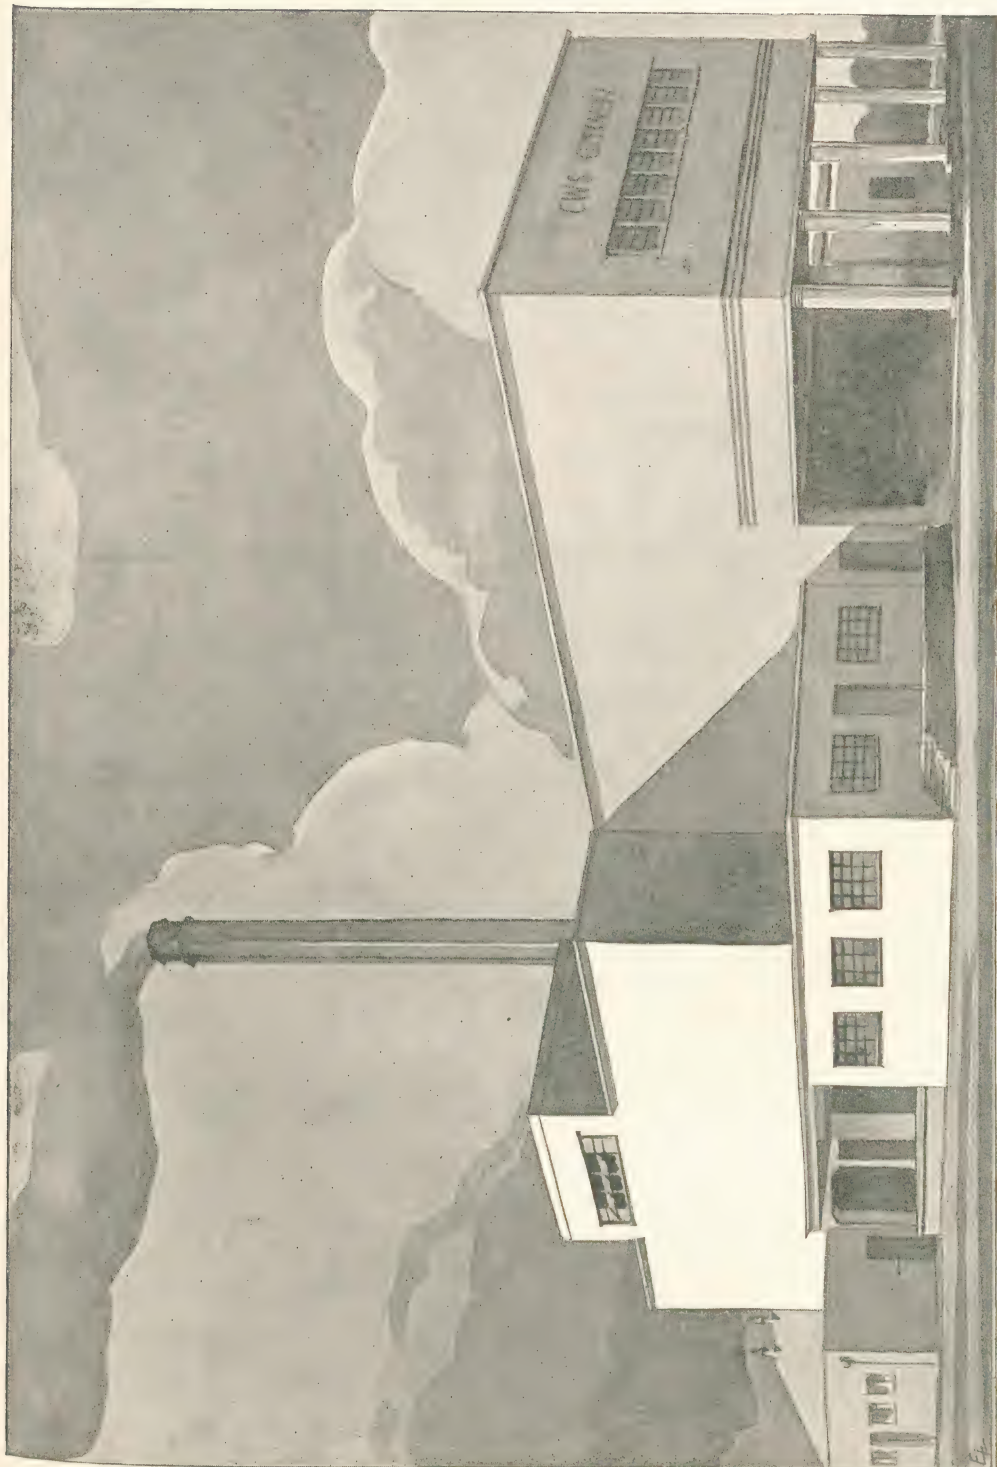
A modern dairy. A reinforced-concrete building of well-proportioned cubic shapes. L. G. Ekins, Architect.
